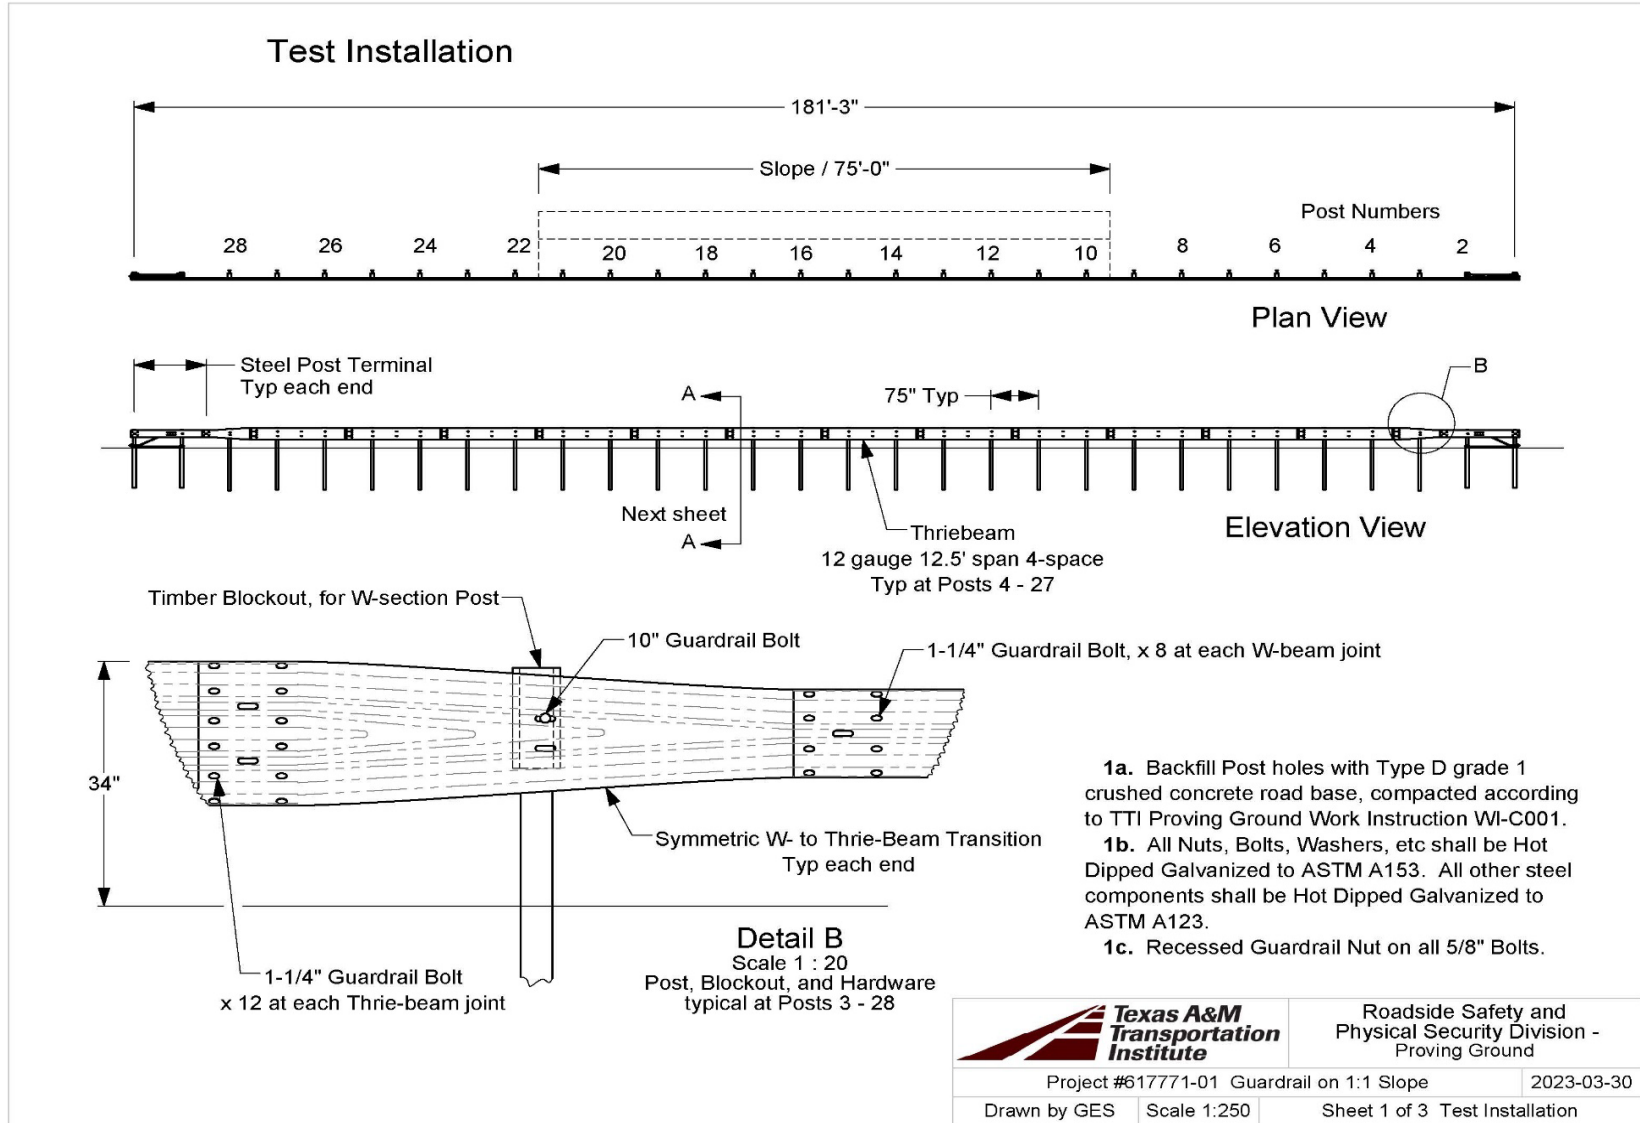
Details of Guardrail System on 1:1 Slope.
